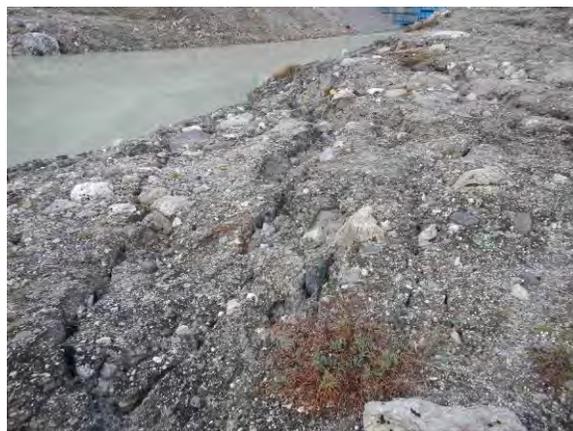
Cracking at the inlet from the lake to the outlet structure.
